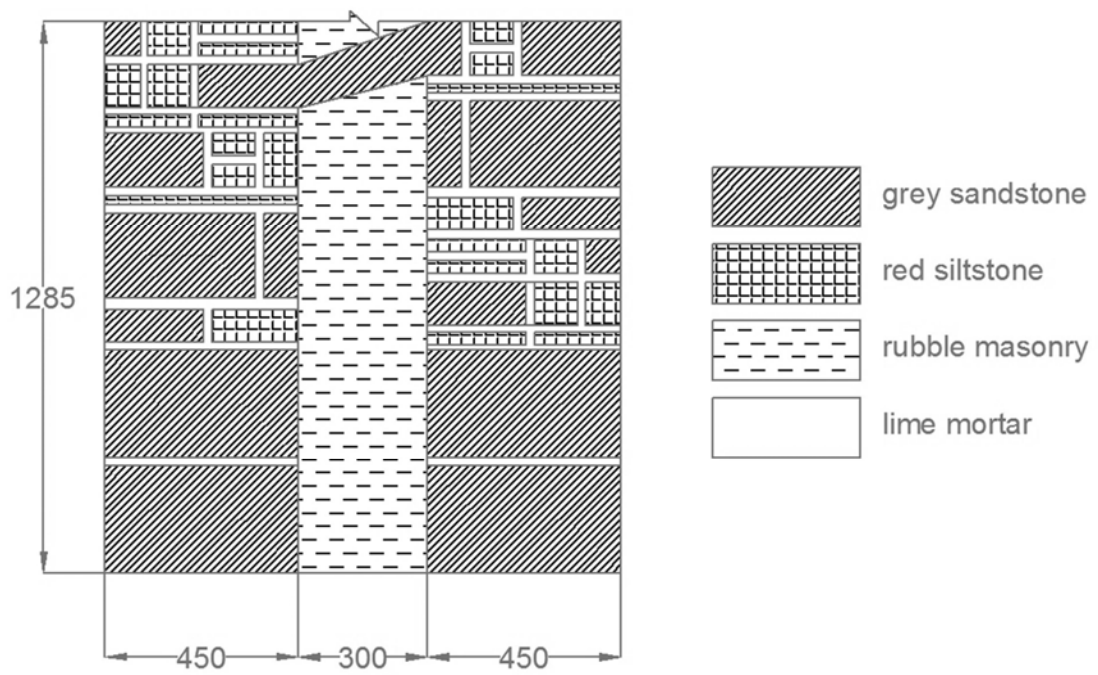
Sectional wall configuration 3 with connecting stones and legend
